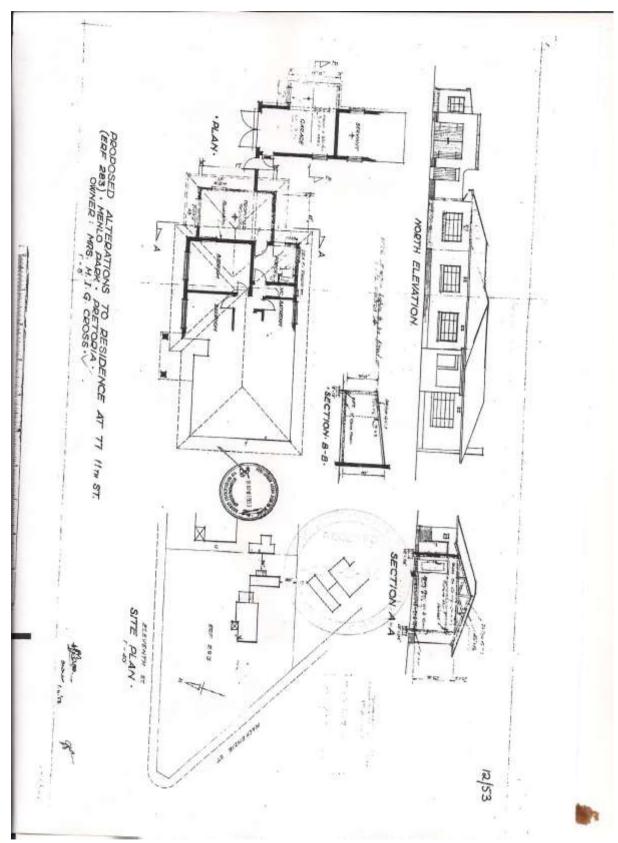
Building plans dating to 1953 for proposed alterations to Mrs. Cross's home.
